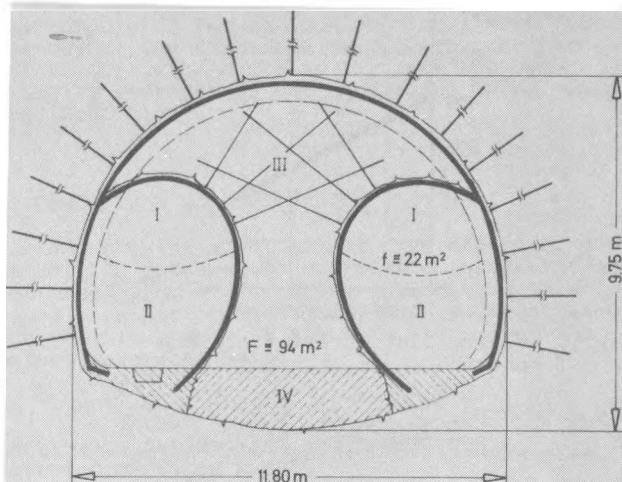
Excavation phases and support of side wall gallery driving (S.W.G.D.).
